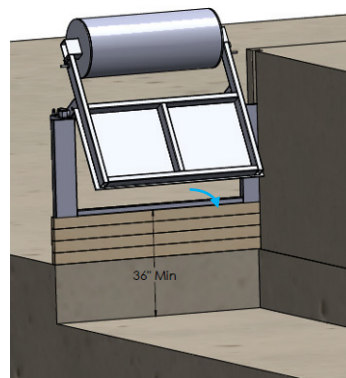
Conceptual plan and side view of new flap gates to be installed in a new structure in the Tabor Feeder Canal at Falls Creek
